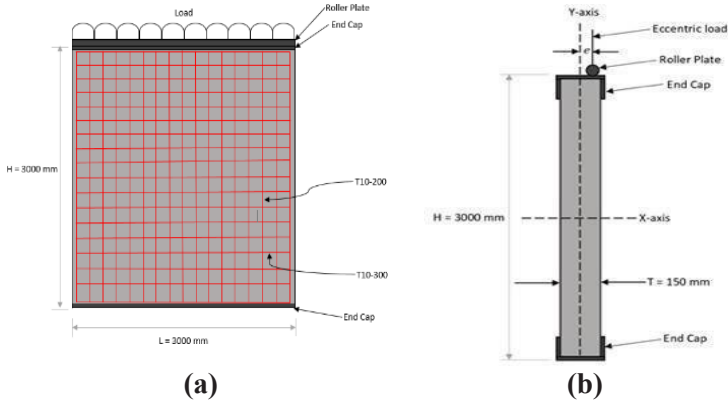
Design Model Wall Panel (a) reinforcement arrangement (b) position of eccentric load.
